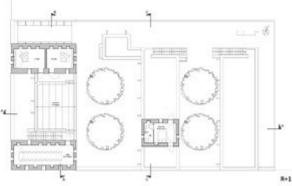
Floor plan of the second floor (©Al-Mizan Architecture)
